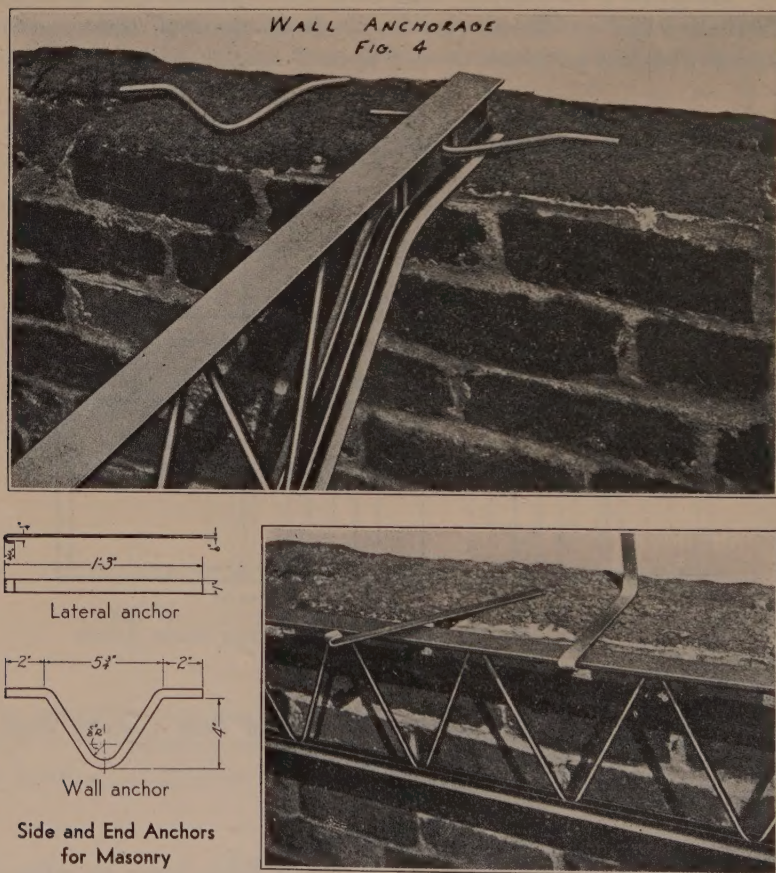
WALL ANCHORAGE FOR STEEL JOISTS
